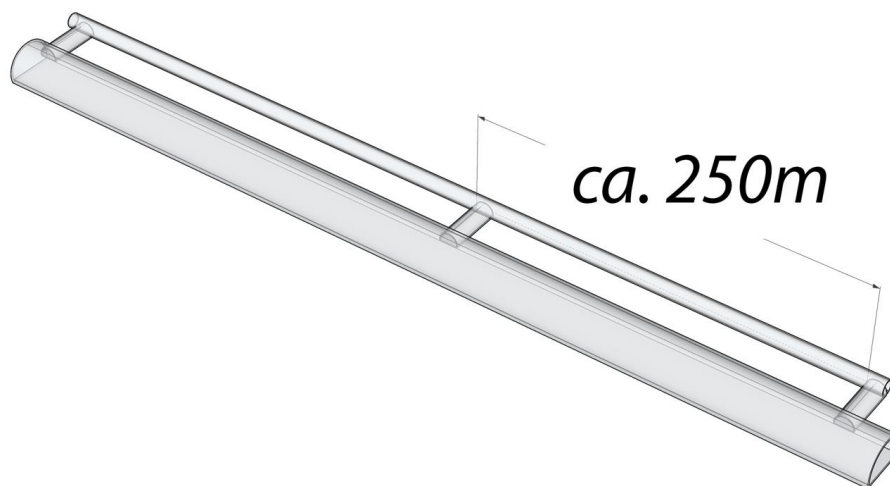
Illustration of parallel small tunnel next to the main tunnel connected by short tunnels.
